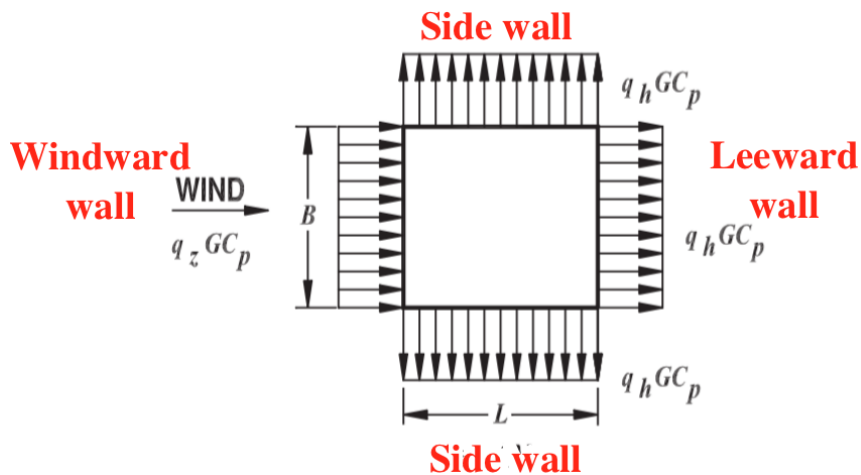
Plan view of the building with designation of windward, leeward and side walls
